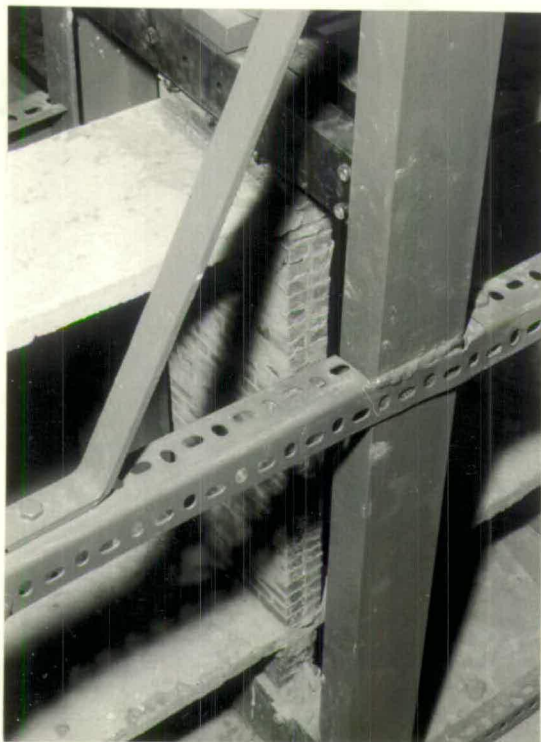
spalling in the top of the wall (stretcher bond with ties)
